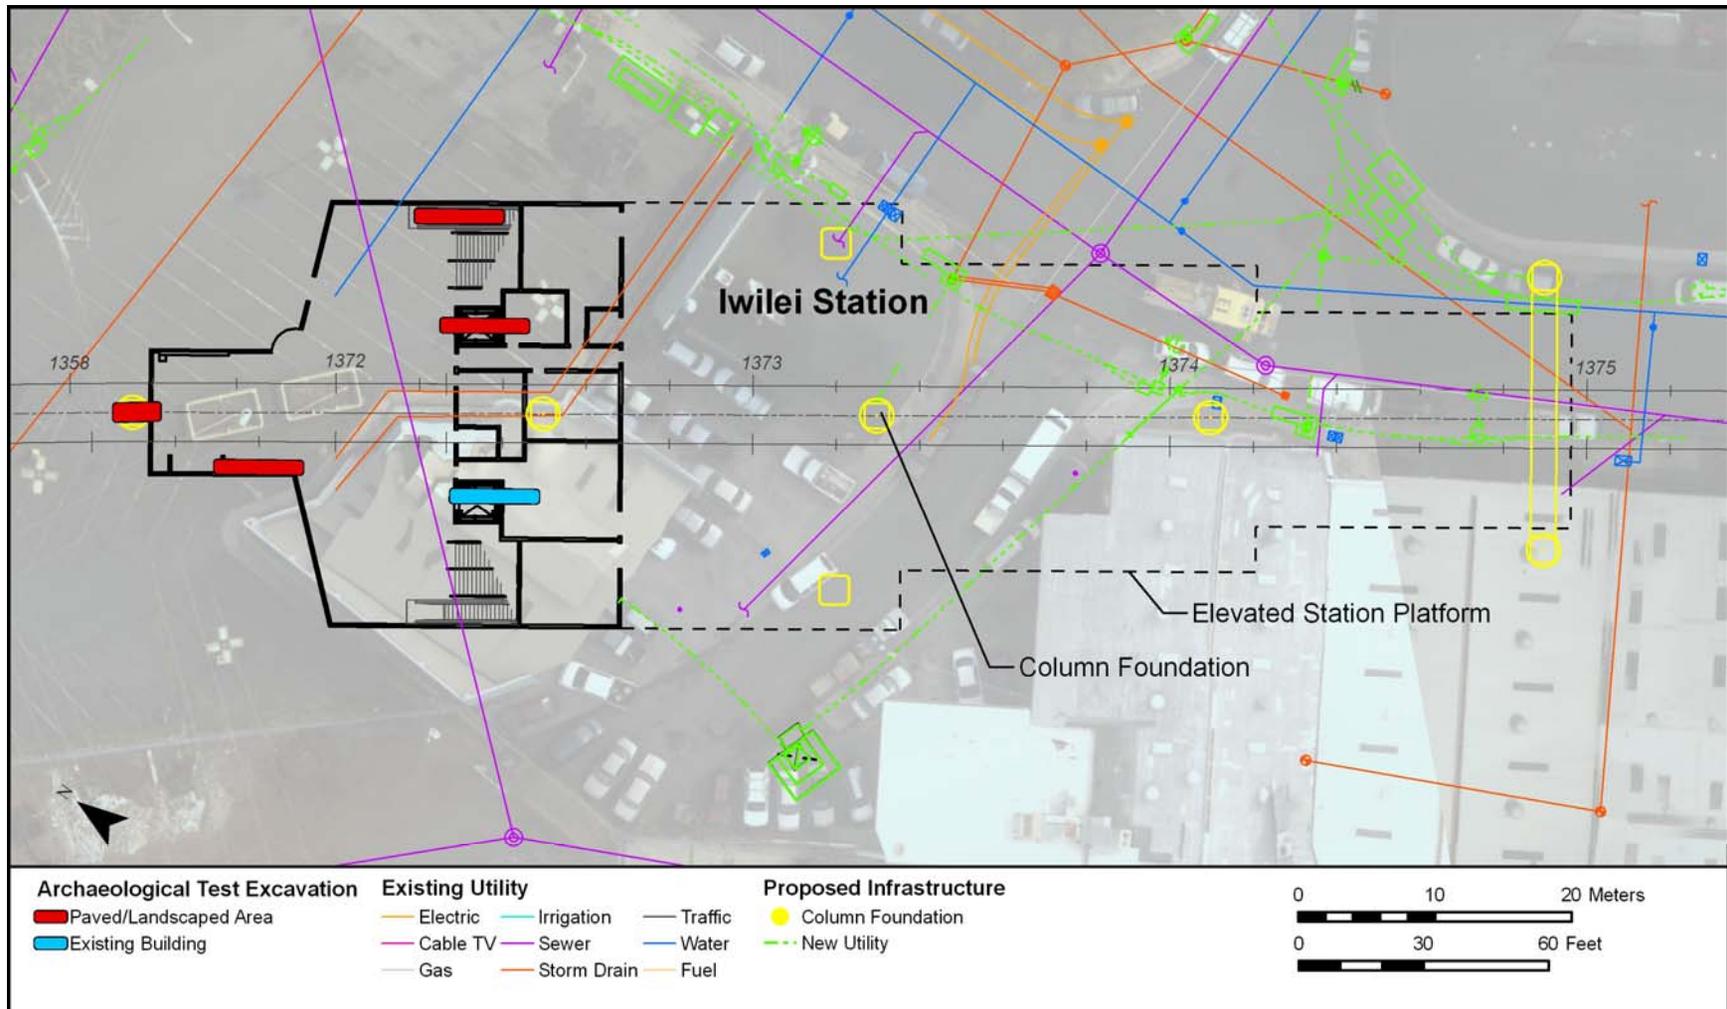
Iwilei Station, detail of column foundation layout (no testing of seven station column foundations due to their location in a former fishpond and constraints)
